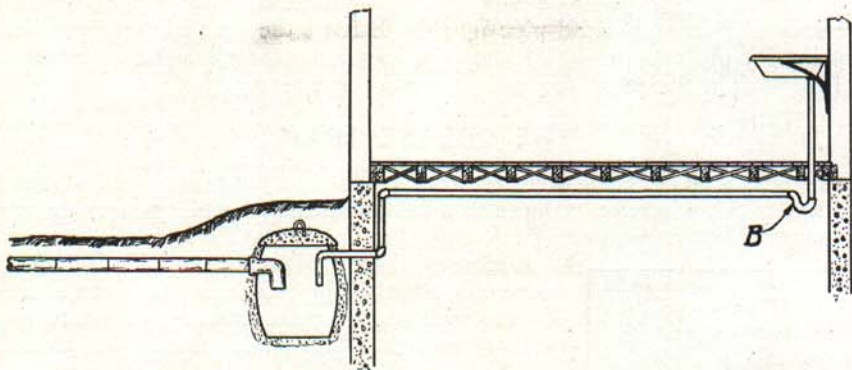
A trap (B) should be placed in sewer line when sink is eight feet or more from outside wall.
